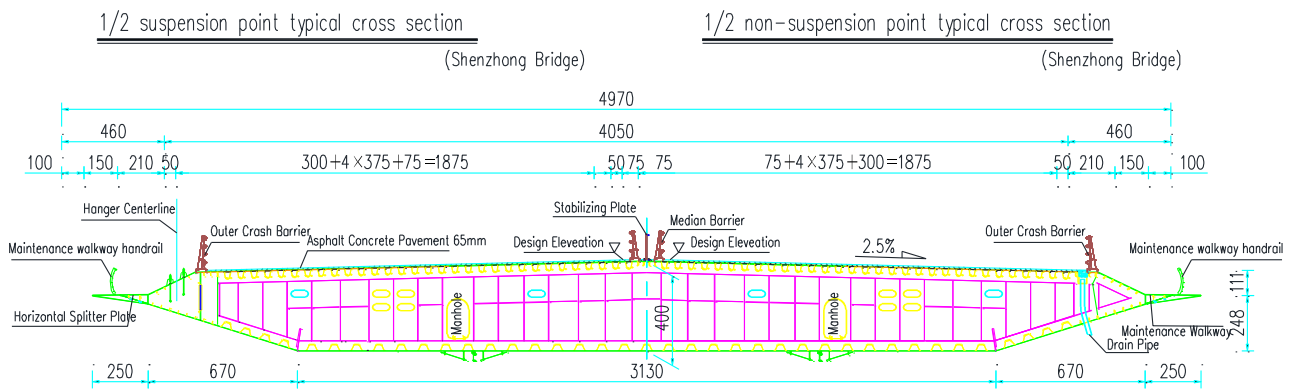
Steel box girder cross section of the Shenzhong Bridge
